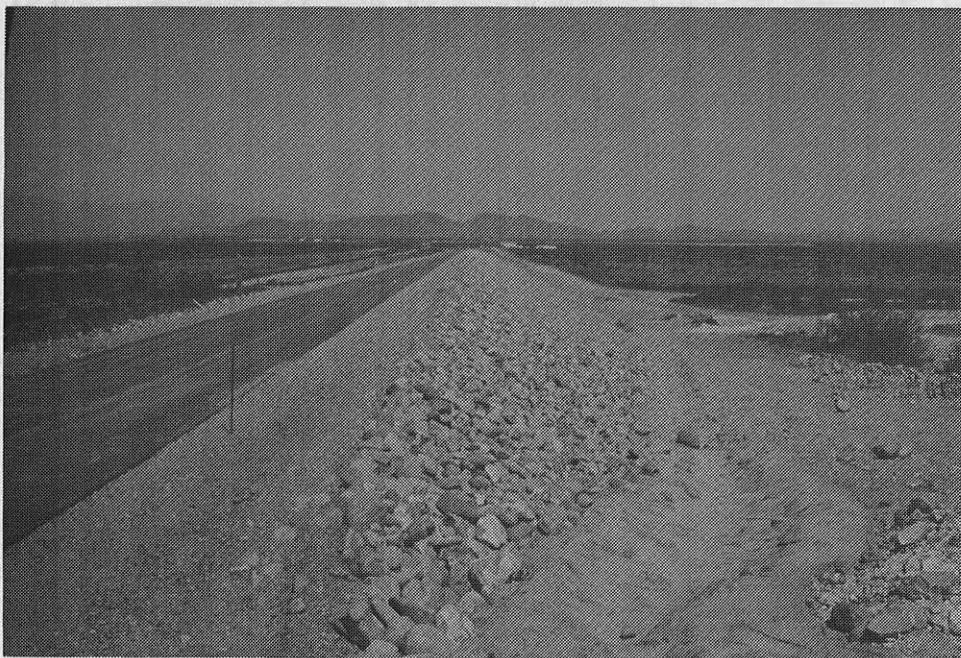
Crest and upstream face of dike no. 1 embankment as viewed from south abutment. Note grouted stone gutter along embankment toe. March 1985
